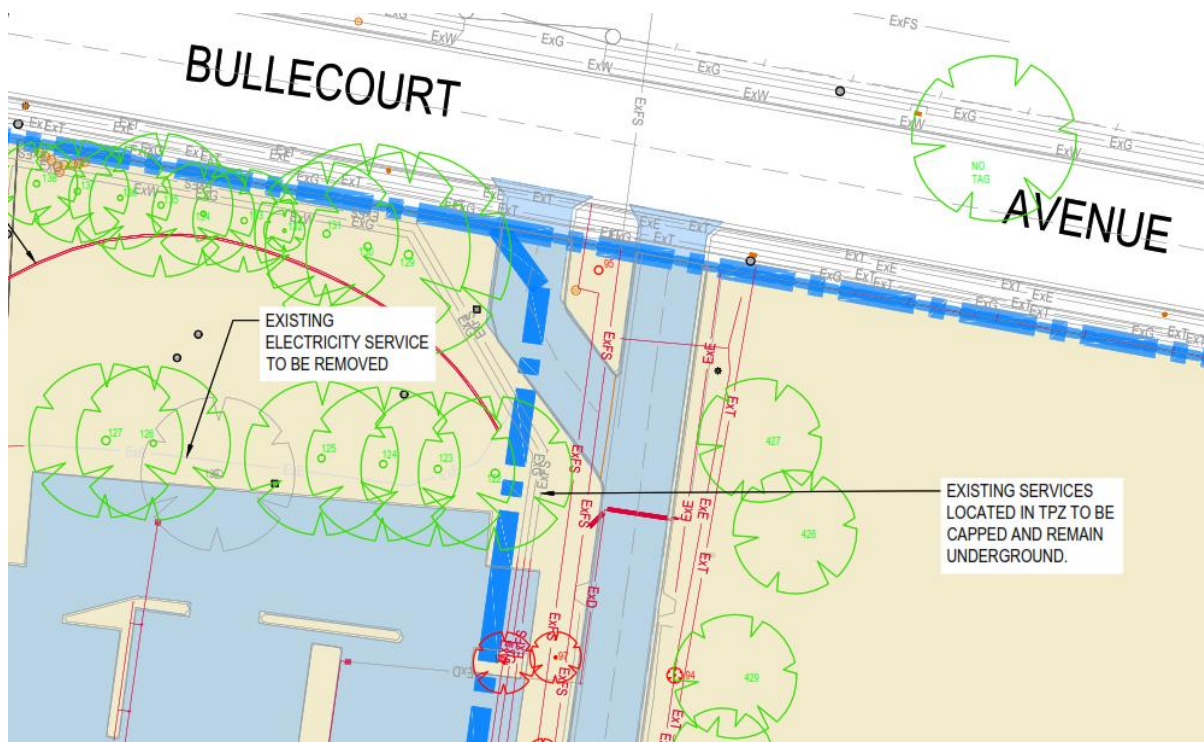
Excerpt Demolition Plan Sheet 2 of 6, showing proposed demolition of existing road at Bullecourt Road site access.
